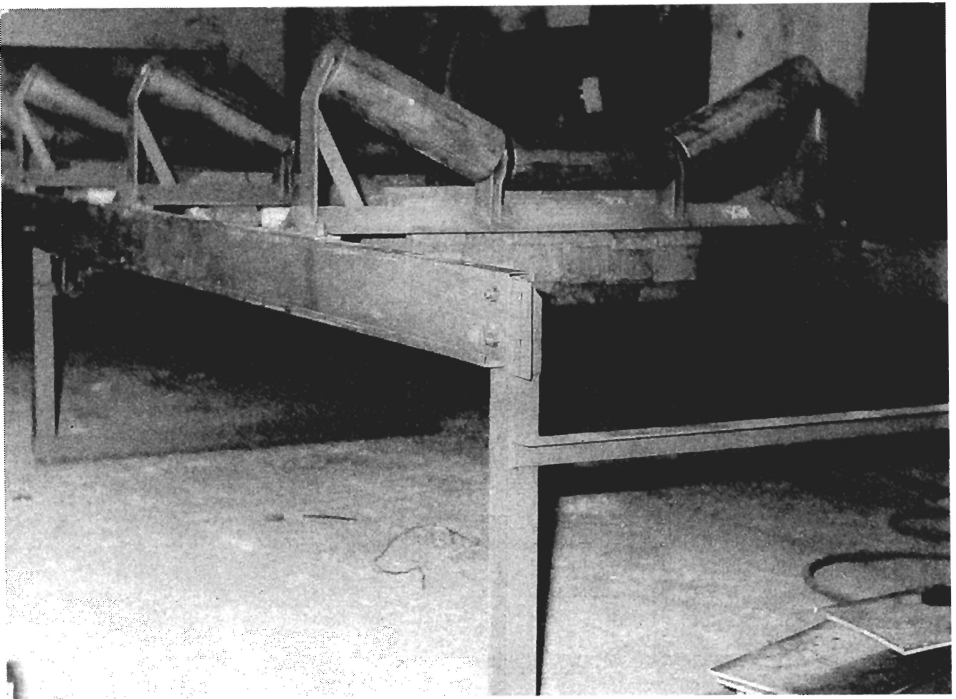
Conveyor stringers: Z Section under prototype testing. Loads applied using crusher hammer rings
